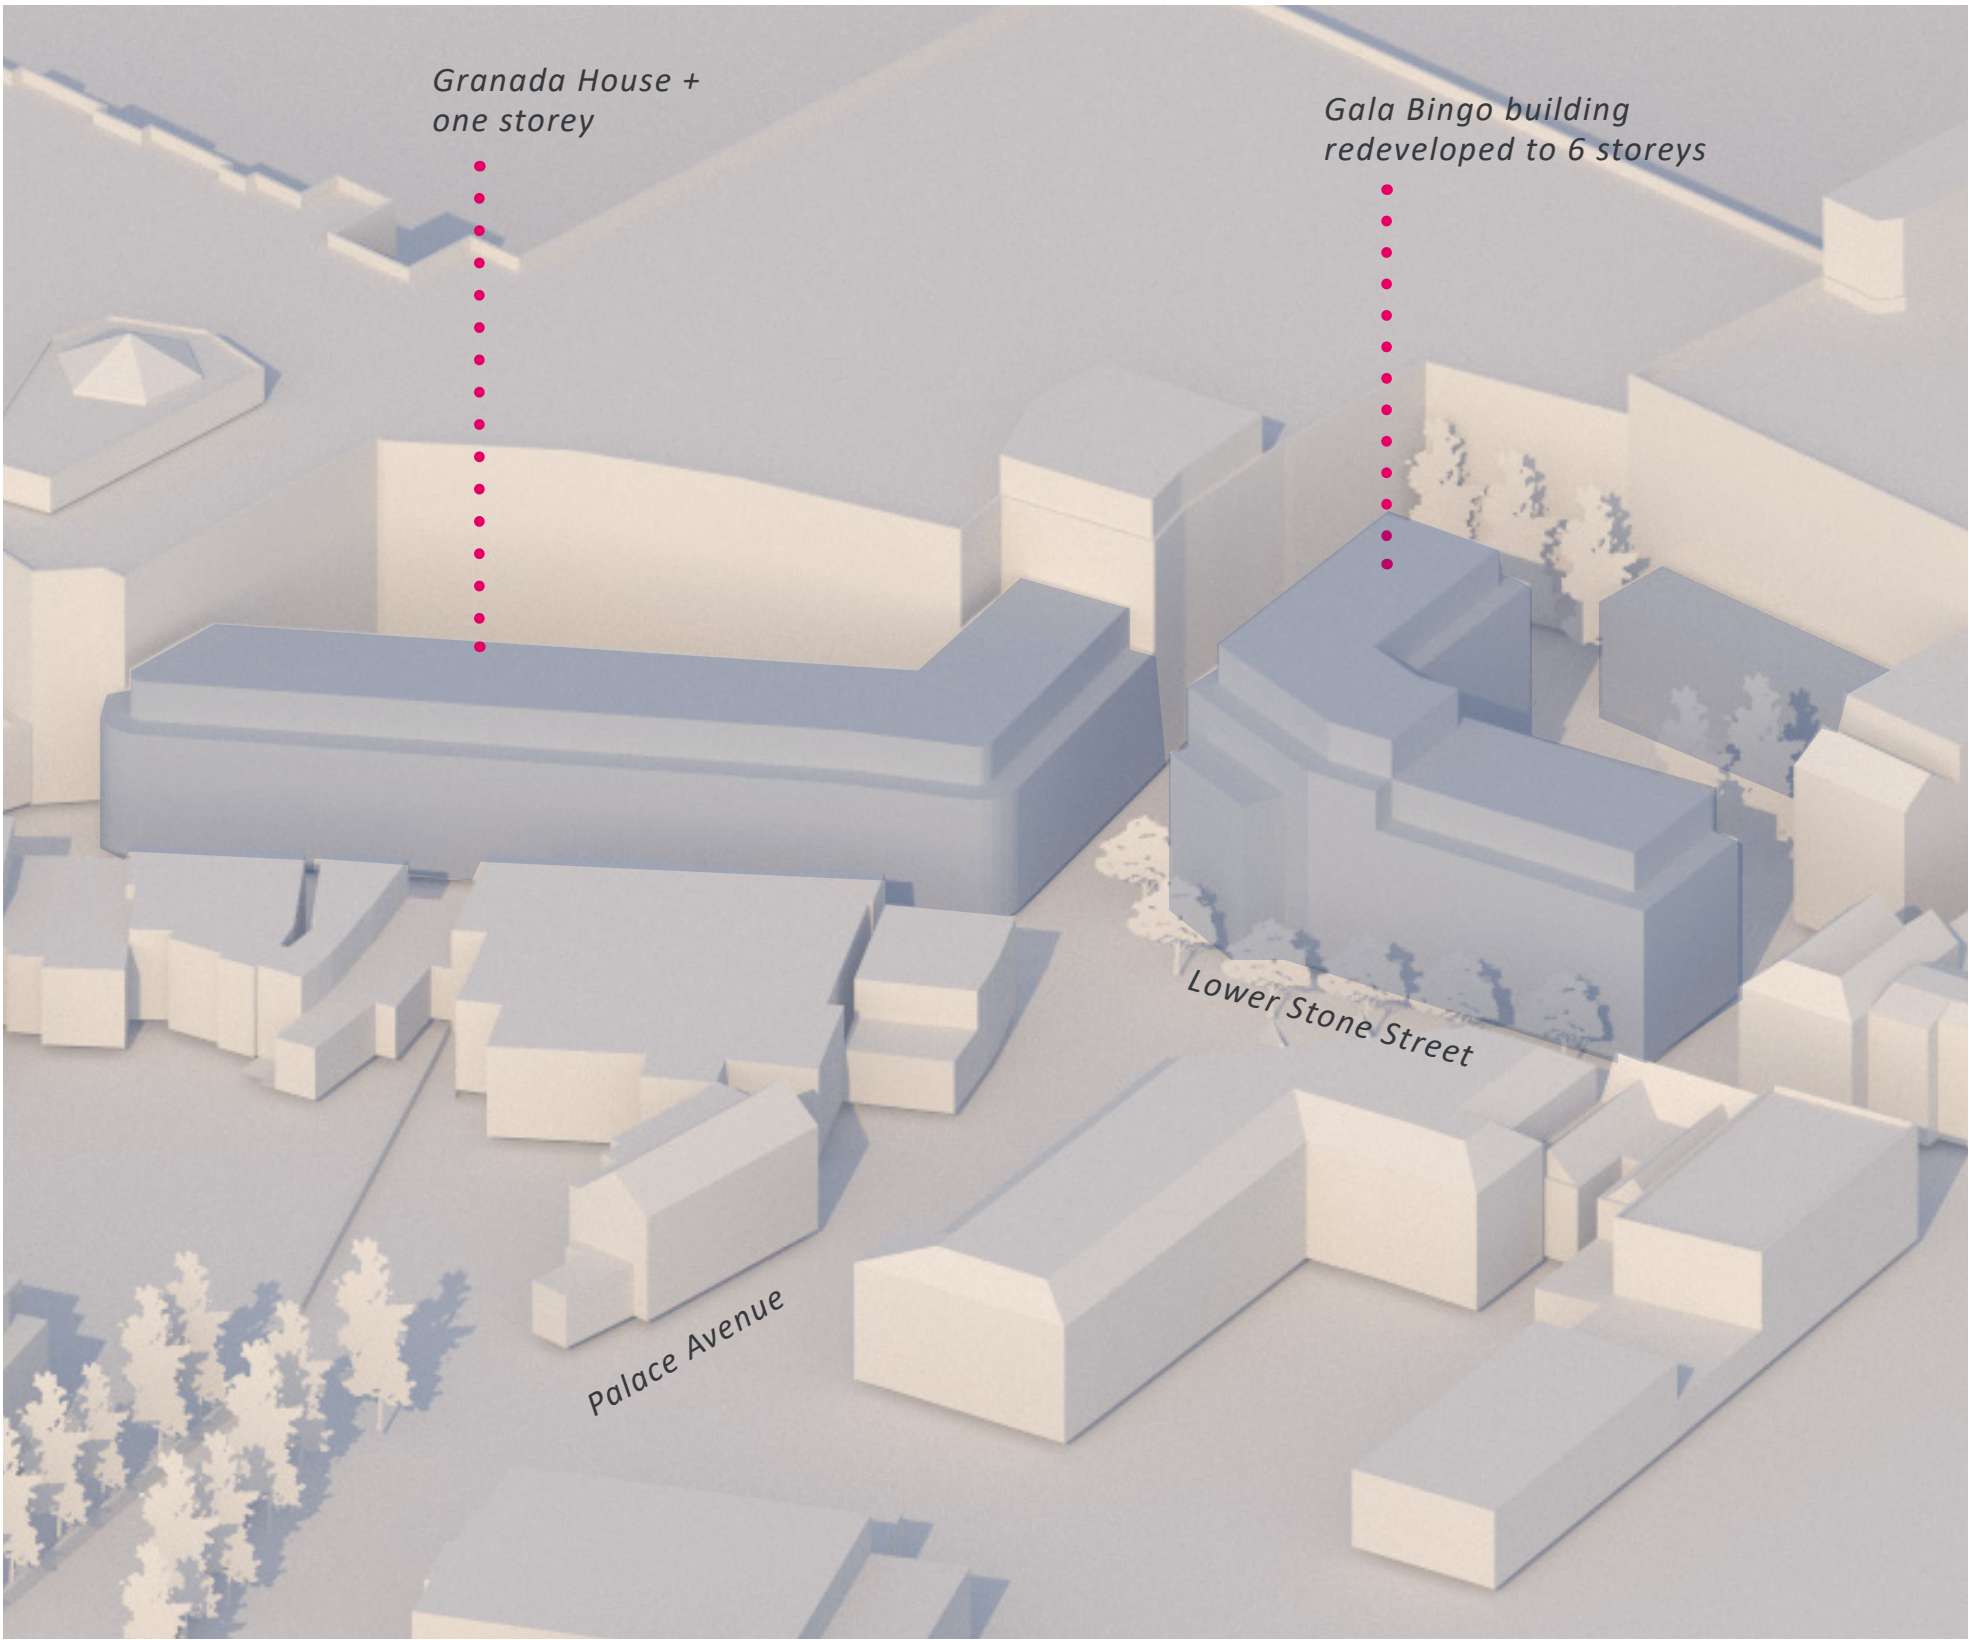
Illustrative massing model: Preferred scenario showing new 6 storey block on Gala Bingo site and an additional storeys on Granada House, viewed from south-west.
